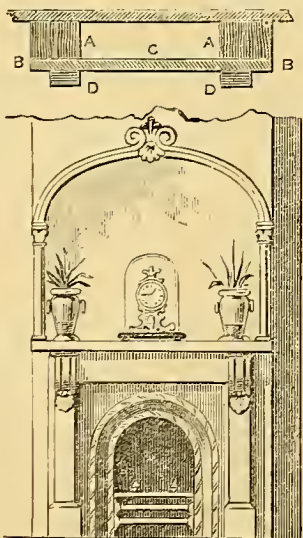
CHIMNEY PIECE, ELEVATION.
